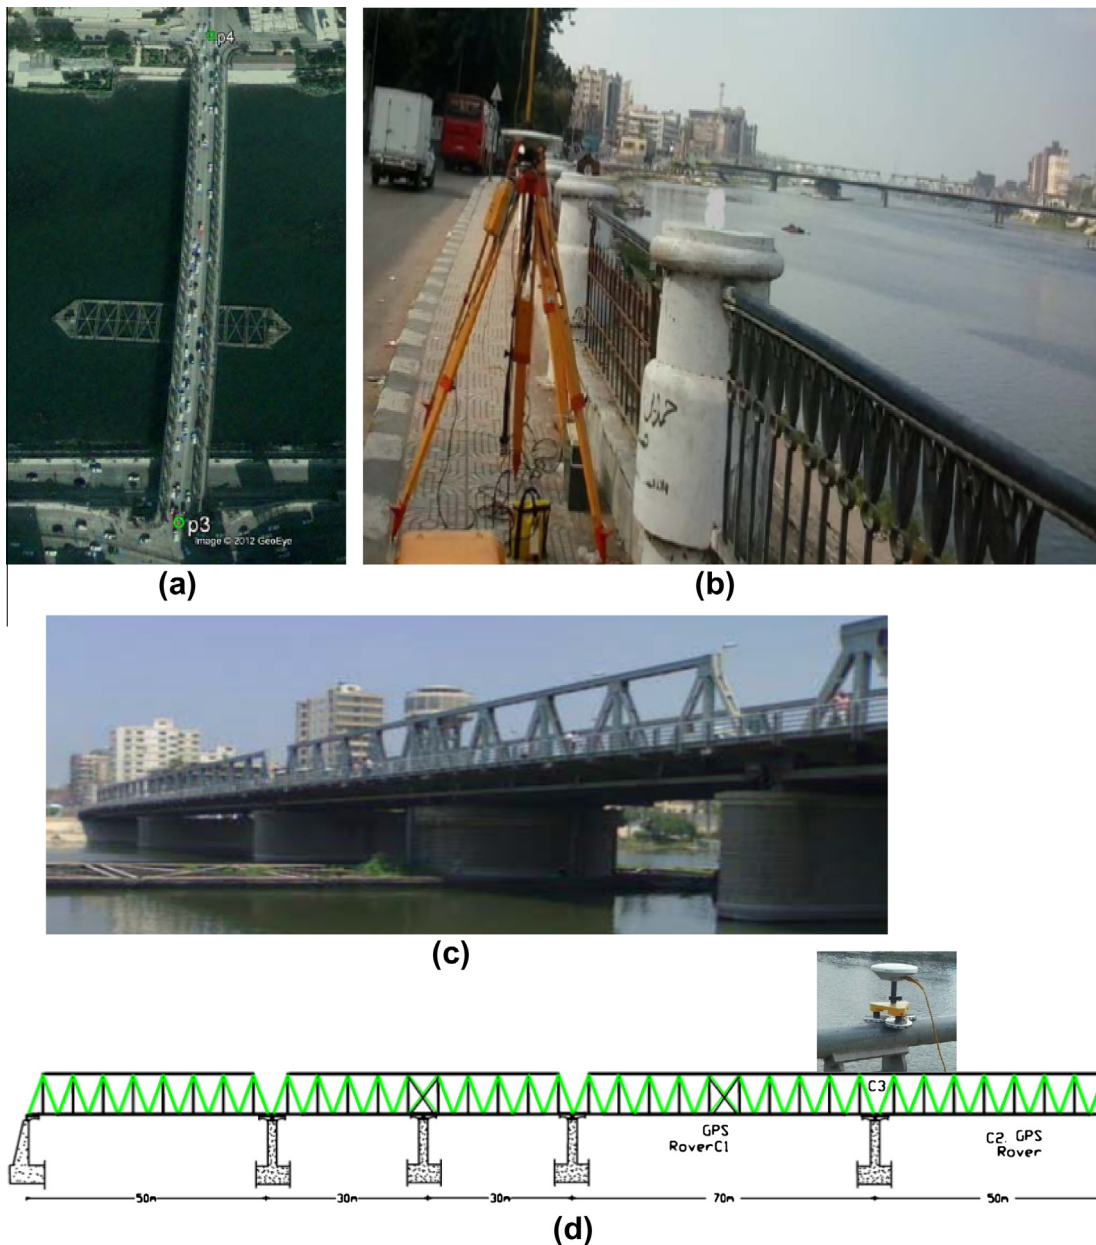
(a) View of Google Earth bridge plan, (b) GPS-base station with side view of the bridge, (c) view of the bridge and (d) longitudinal section of the bridge with positions of the GPS rover.
